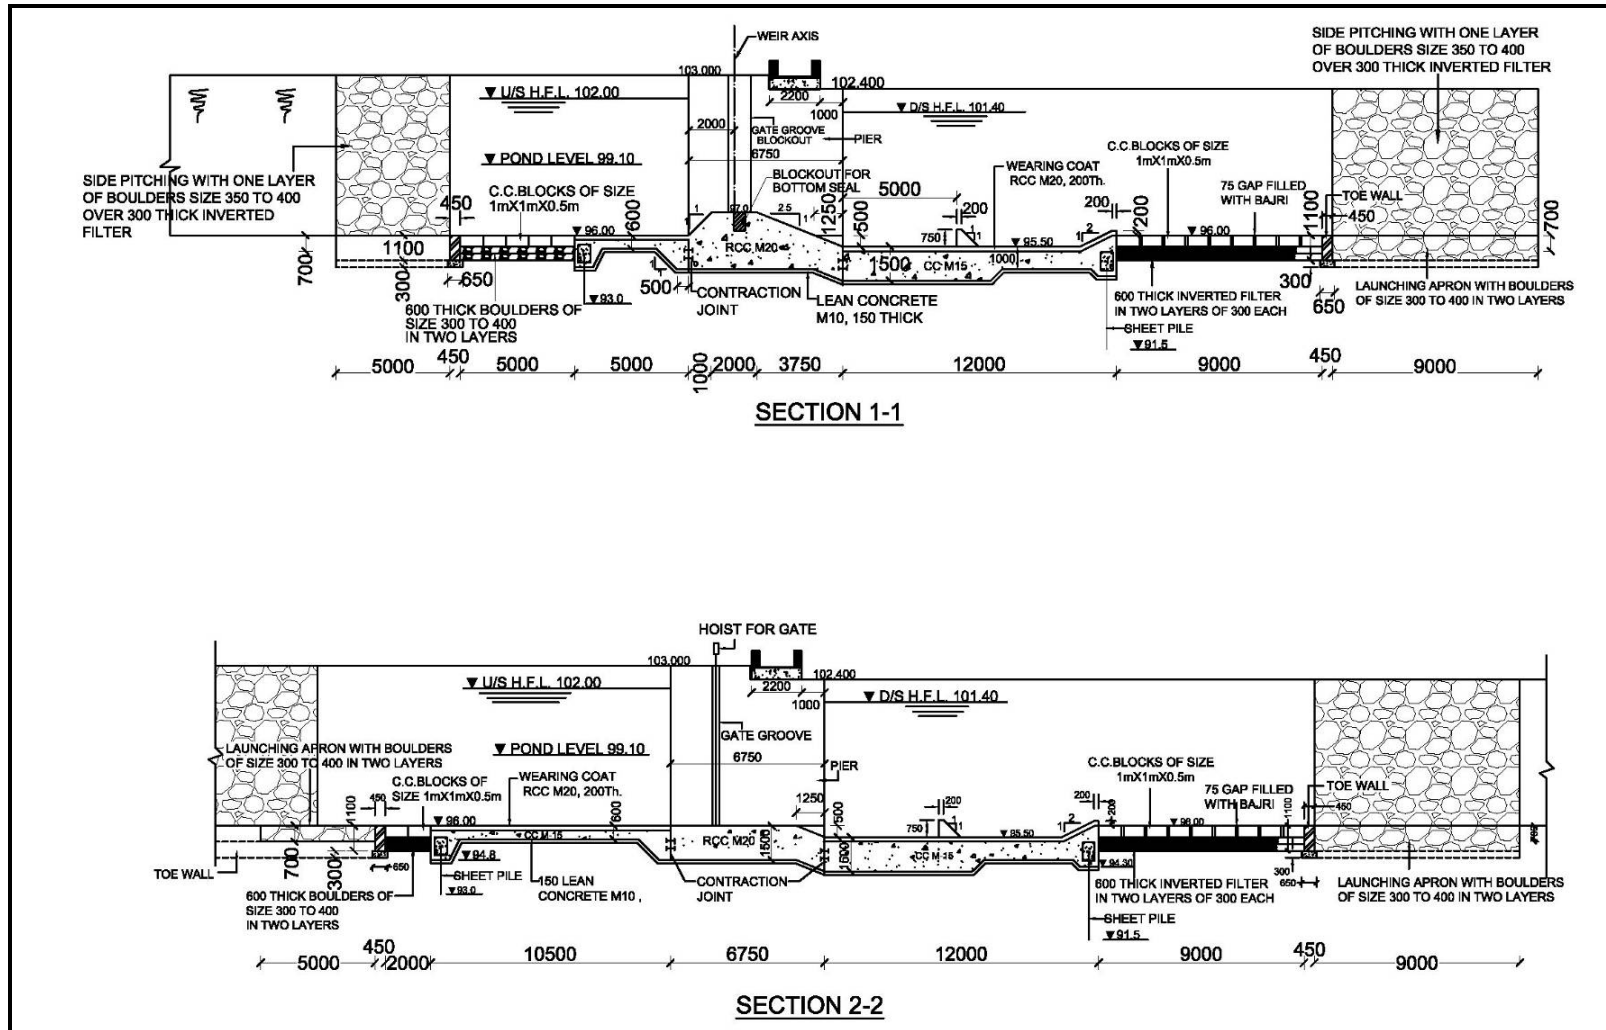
(b): Typical Details of a Raised Weir on Erodible Foundation (Section)
